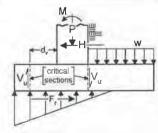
Example of Critical Section for Shear in Footings
